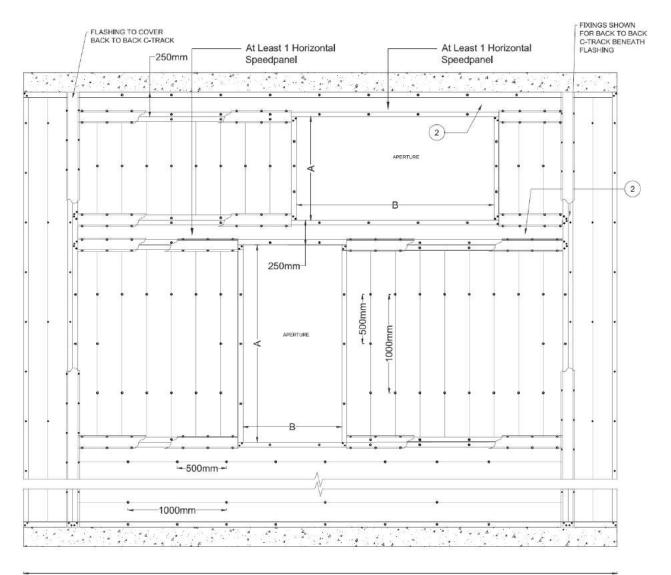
Typical Horizontal Speedpanel details around multiple apertures with vertical infill.
